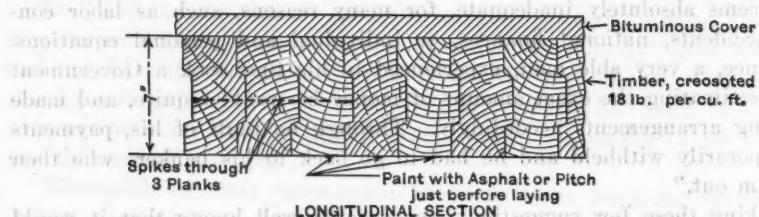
TIMBER FLOOR CONSTRUCTION.
